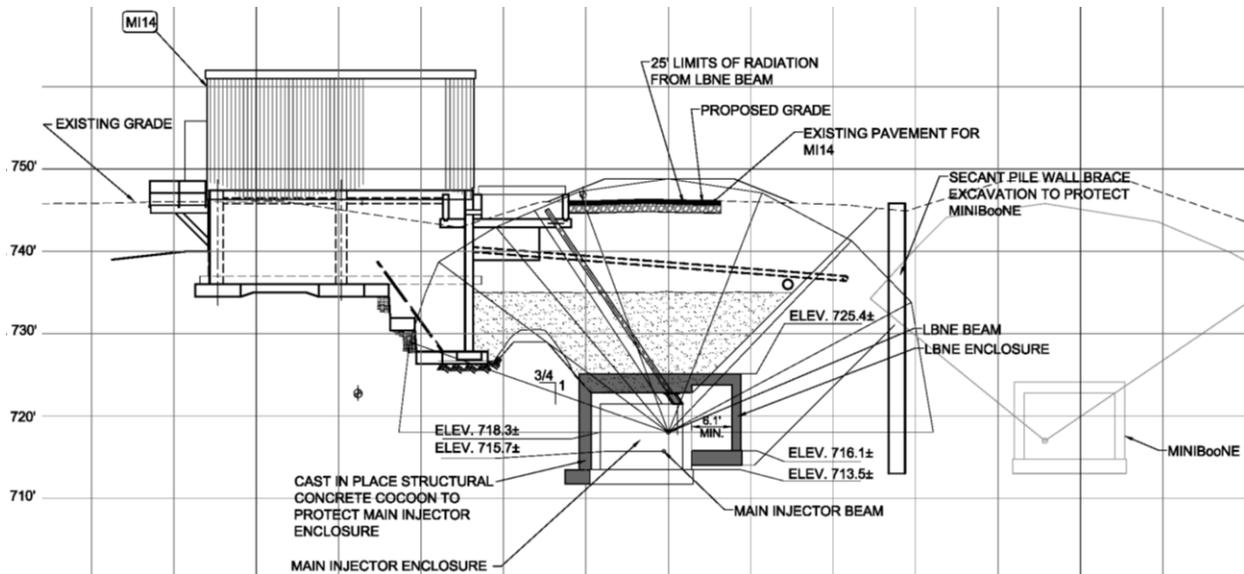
Beamline Extraction Enclosure section view at MI-14 showing the structural concrete cocoon around the MI enclosure (Section A-A as noted in Figure 5-2).
